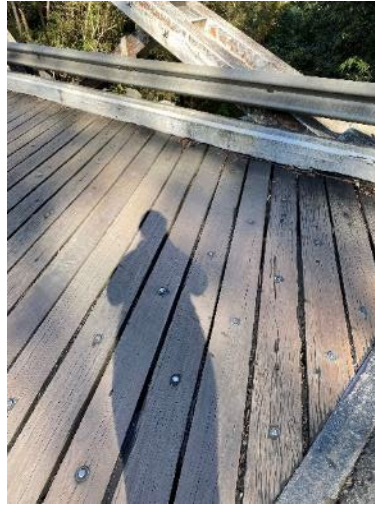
Another view of the transverse timber decking including concrete infill between road surface, facing south east
